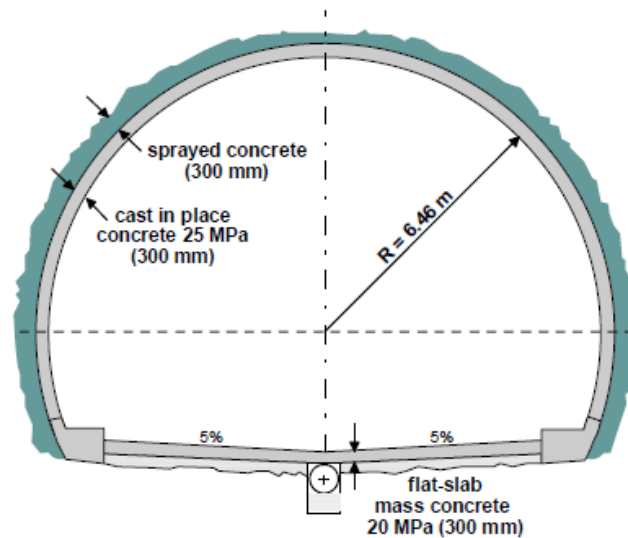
Original cross section of Lilla tunnel (Berdugo, 2007)
